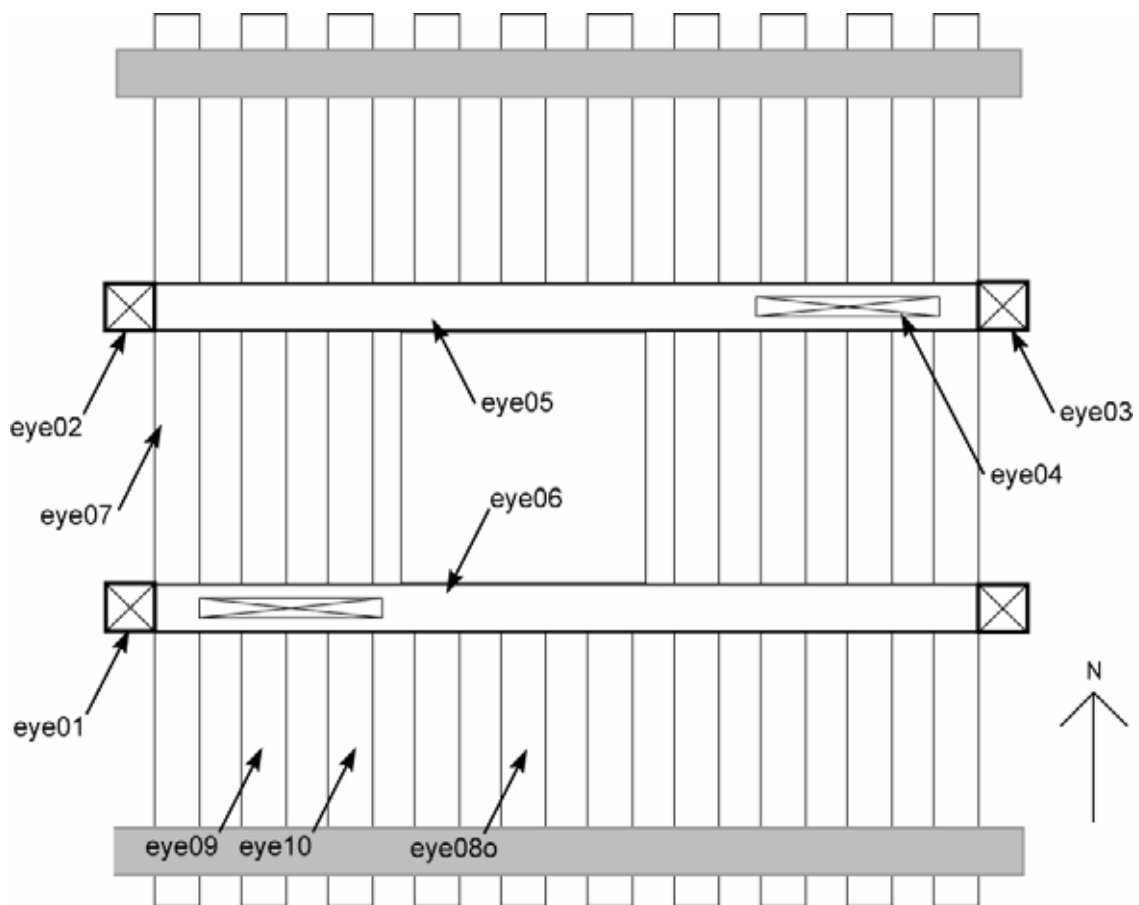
Plan of the belfry floor, from below, showing the positions of the sampled timbers; shaded beams are in concrete
